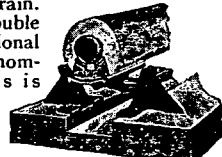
Pipe Saddle. Permits full thickness of insulation between pipe and roller.
